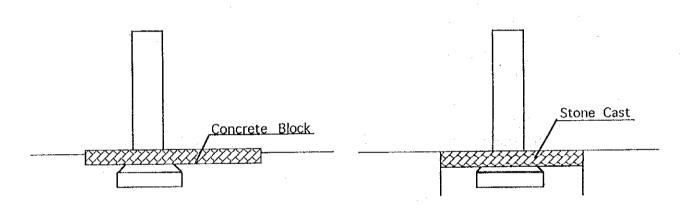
Protection with Concrete Slabs Fig. 9.10 Protection with Stone Cast in Forms
